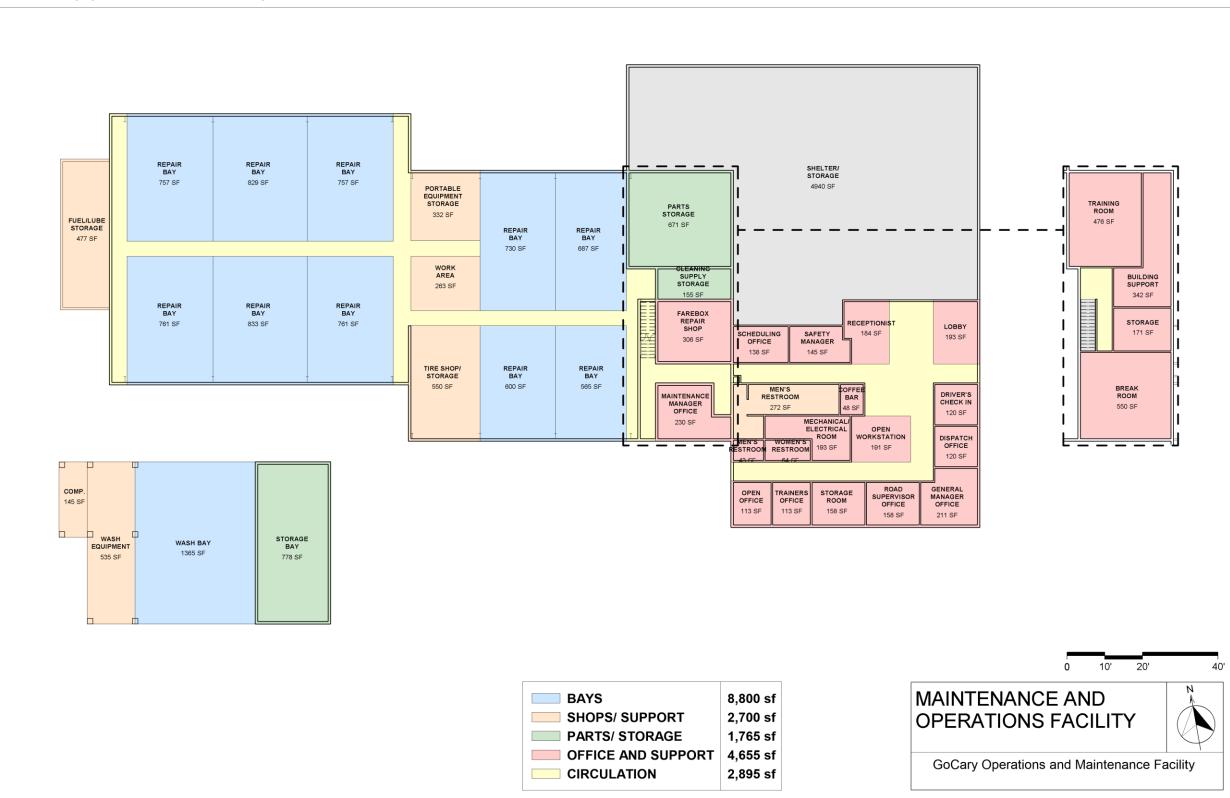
#### Exhibit AR: GoCary Operations and Maintenance Facility Floor Plan
